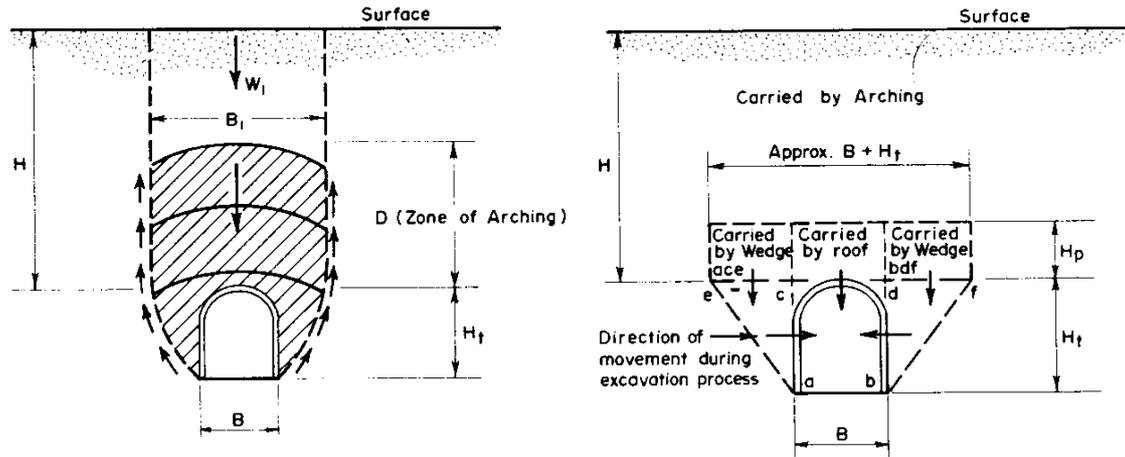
Terzaghi's recommendations for the loading on tunnel linings :
